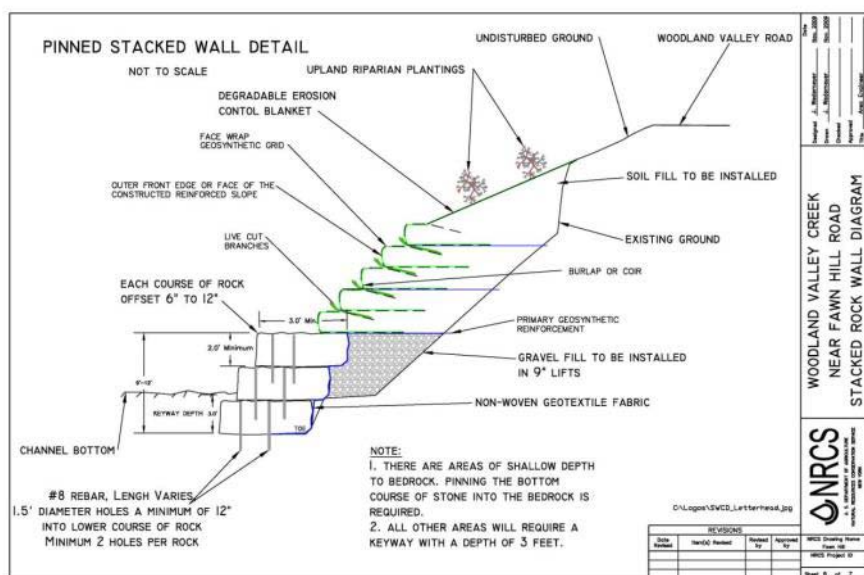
Engineering design of stacked rock wall and bio-engineering application
